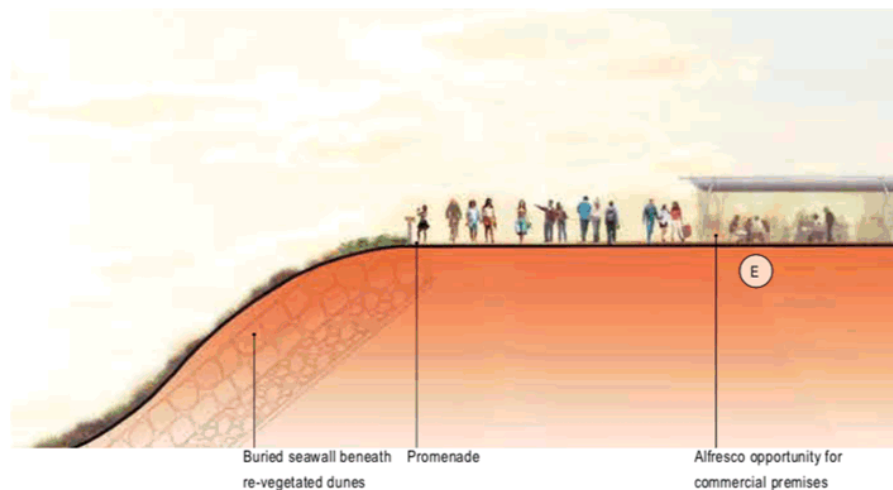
Typical Section showing High Crested Buried Revetment in Masterplan
